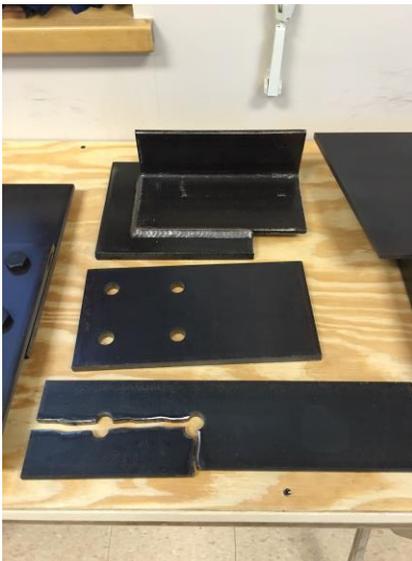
Block Shear & Bolted/Welded Connection Models
